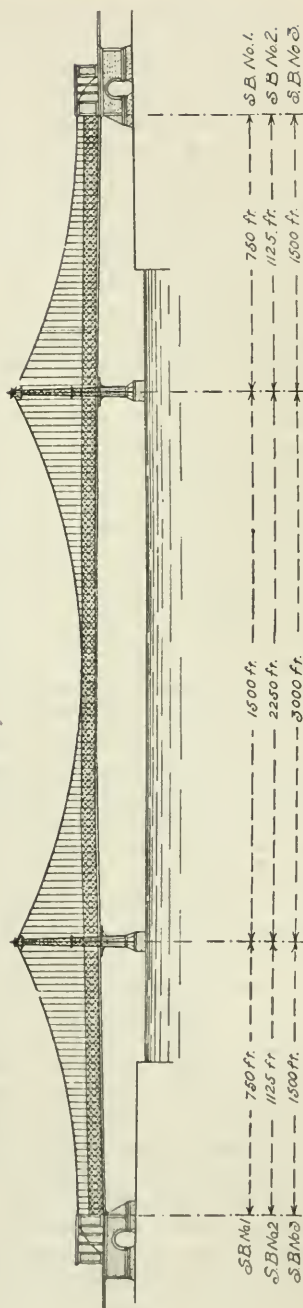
Dr. Steinman's Layouts for Suspension Bridges.
